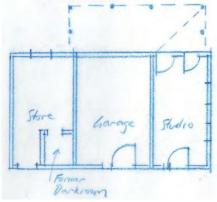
Floorplan of garage built 1956, sketched by Geoff Ashley (2016, p32).
